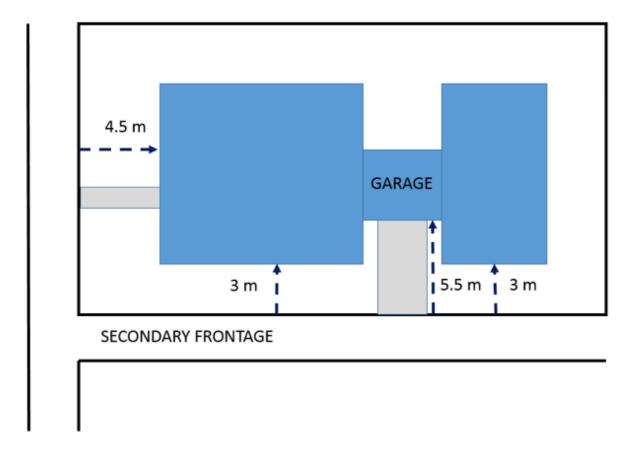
Corner allotment with the main entry to the primary road and the garage to the secondary road, with a setback minimum of 5.5 metres
